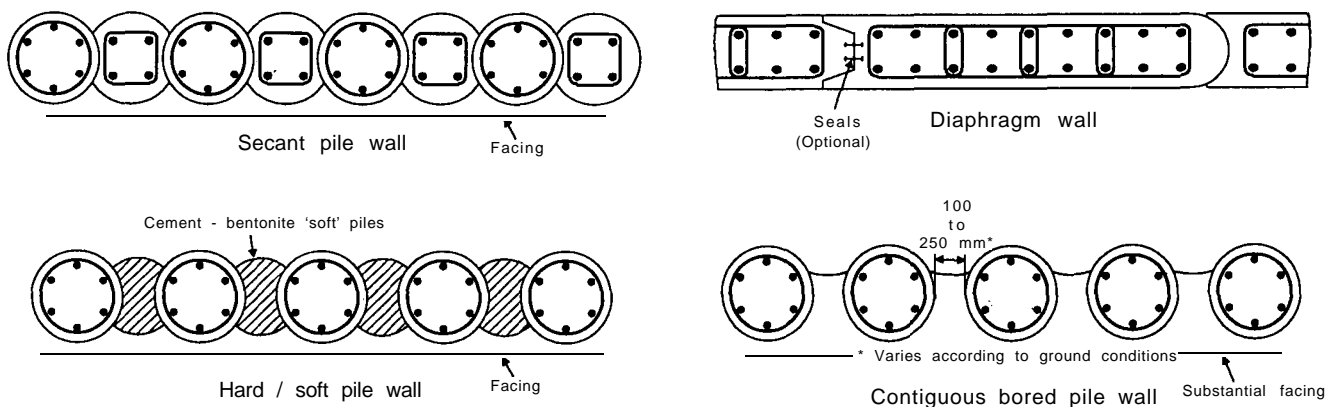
Construction methods for reinforced concrete basements (excluding monolithic box)
